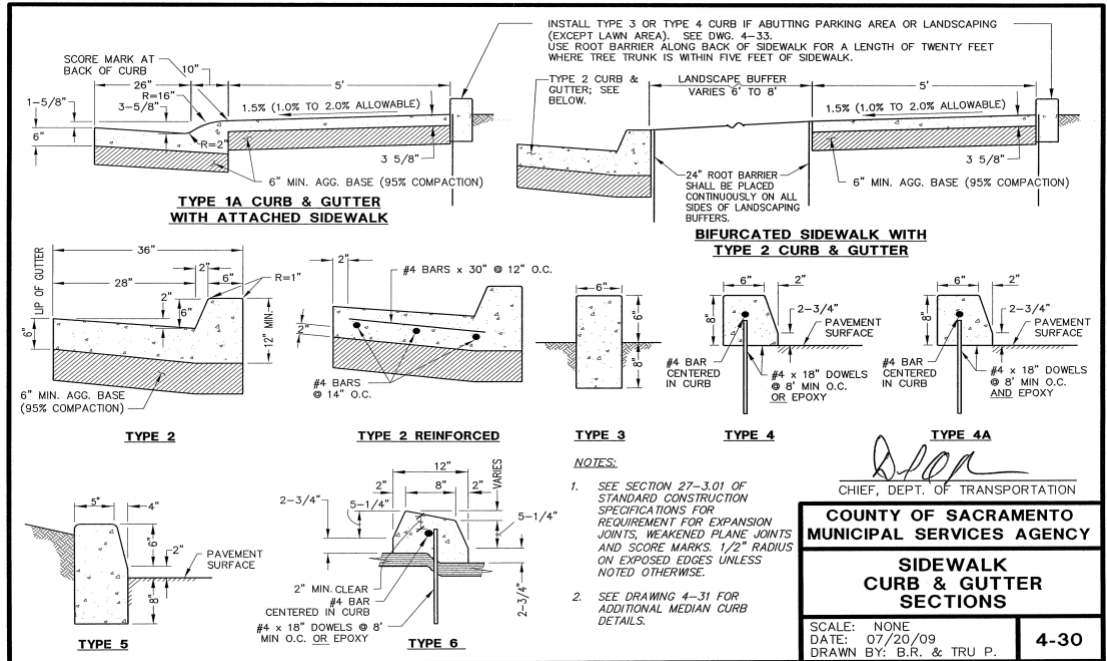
Cross section of Sidewalk, Curb, and Gutter (Sacramento County, 2009)
